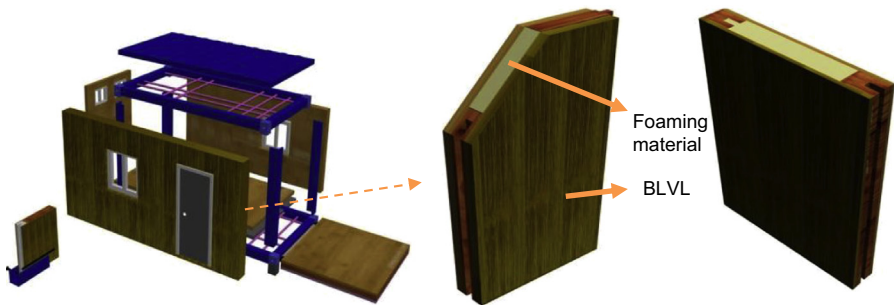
Application of lightweight bamboo-based wall in bamboo steel house.
